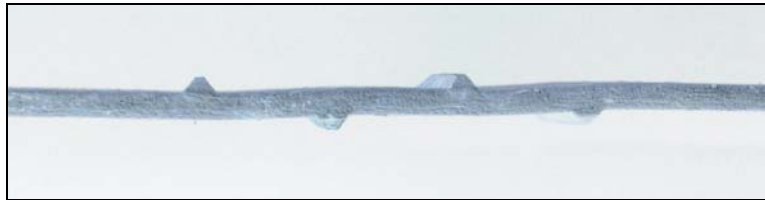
Side View of a Galvanized-steel Earth Reinforcing Strip Displaying the Ribs.
